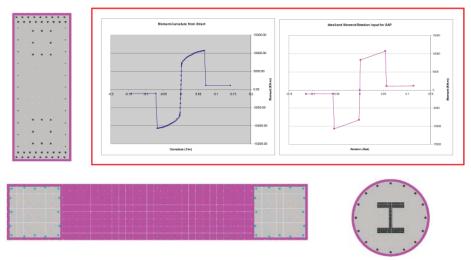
Top Left: Typical link beam finite element cross section in XTRACT; Top Right: Link beam moment curvature from XTRACT and corresponding moment-rotation input into SAP2000; Bottom Left: Typical core-wall finite element cross section in XTRACT; Bottom Right: Typical composite column finite element cross section in XTRACT
